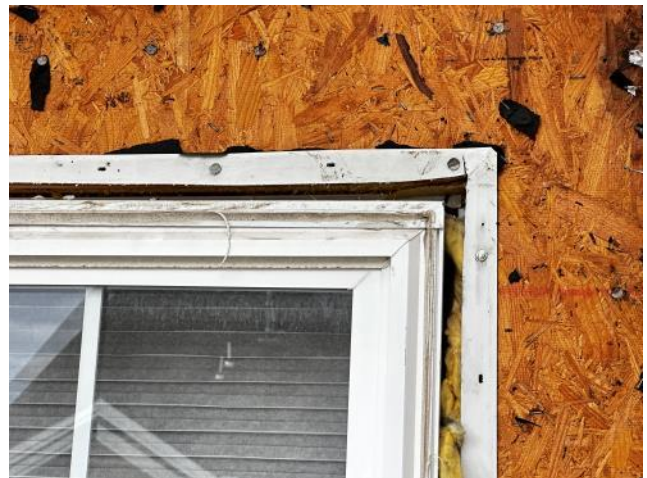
It should be noted that windows at Unit 21 also did not have an integrated flange. Lemus had to install a custom flange in order to properly flash the windows.
